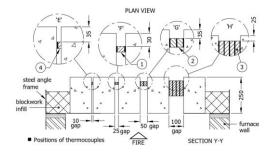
Cross-section of floor linear gap systems D1-D4 – assessment 3 (as shown in WF 157402) – dimensions in mm
